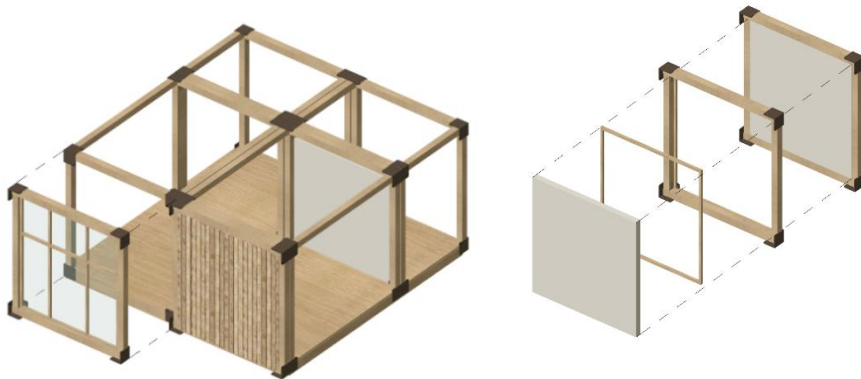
Wall Panel Installation: Prefabricated Panel Mounting, Openings, and Sealing Steps (by the author)
